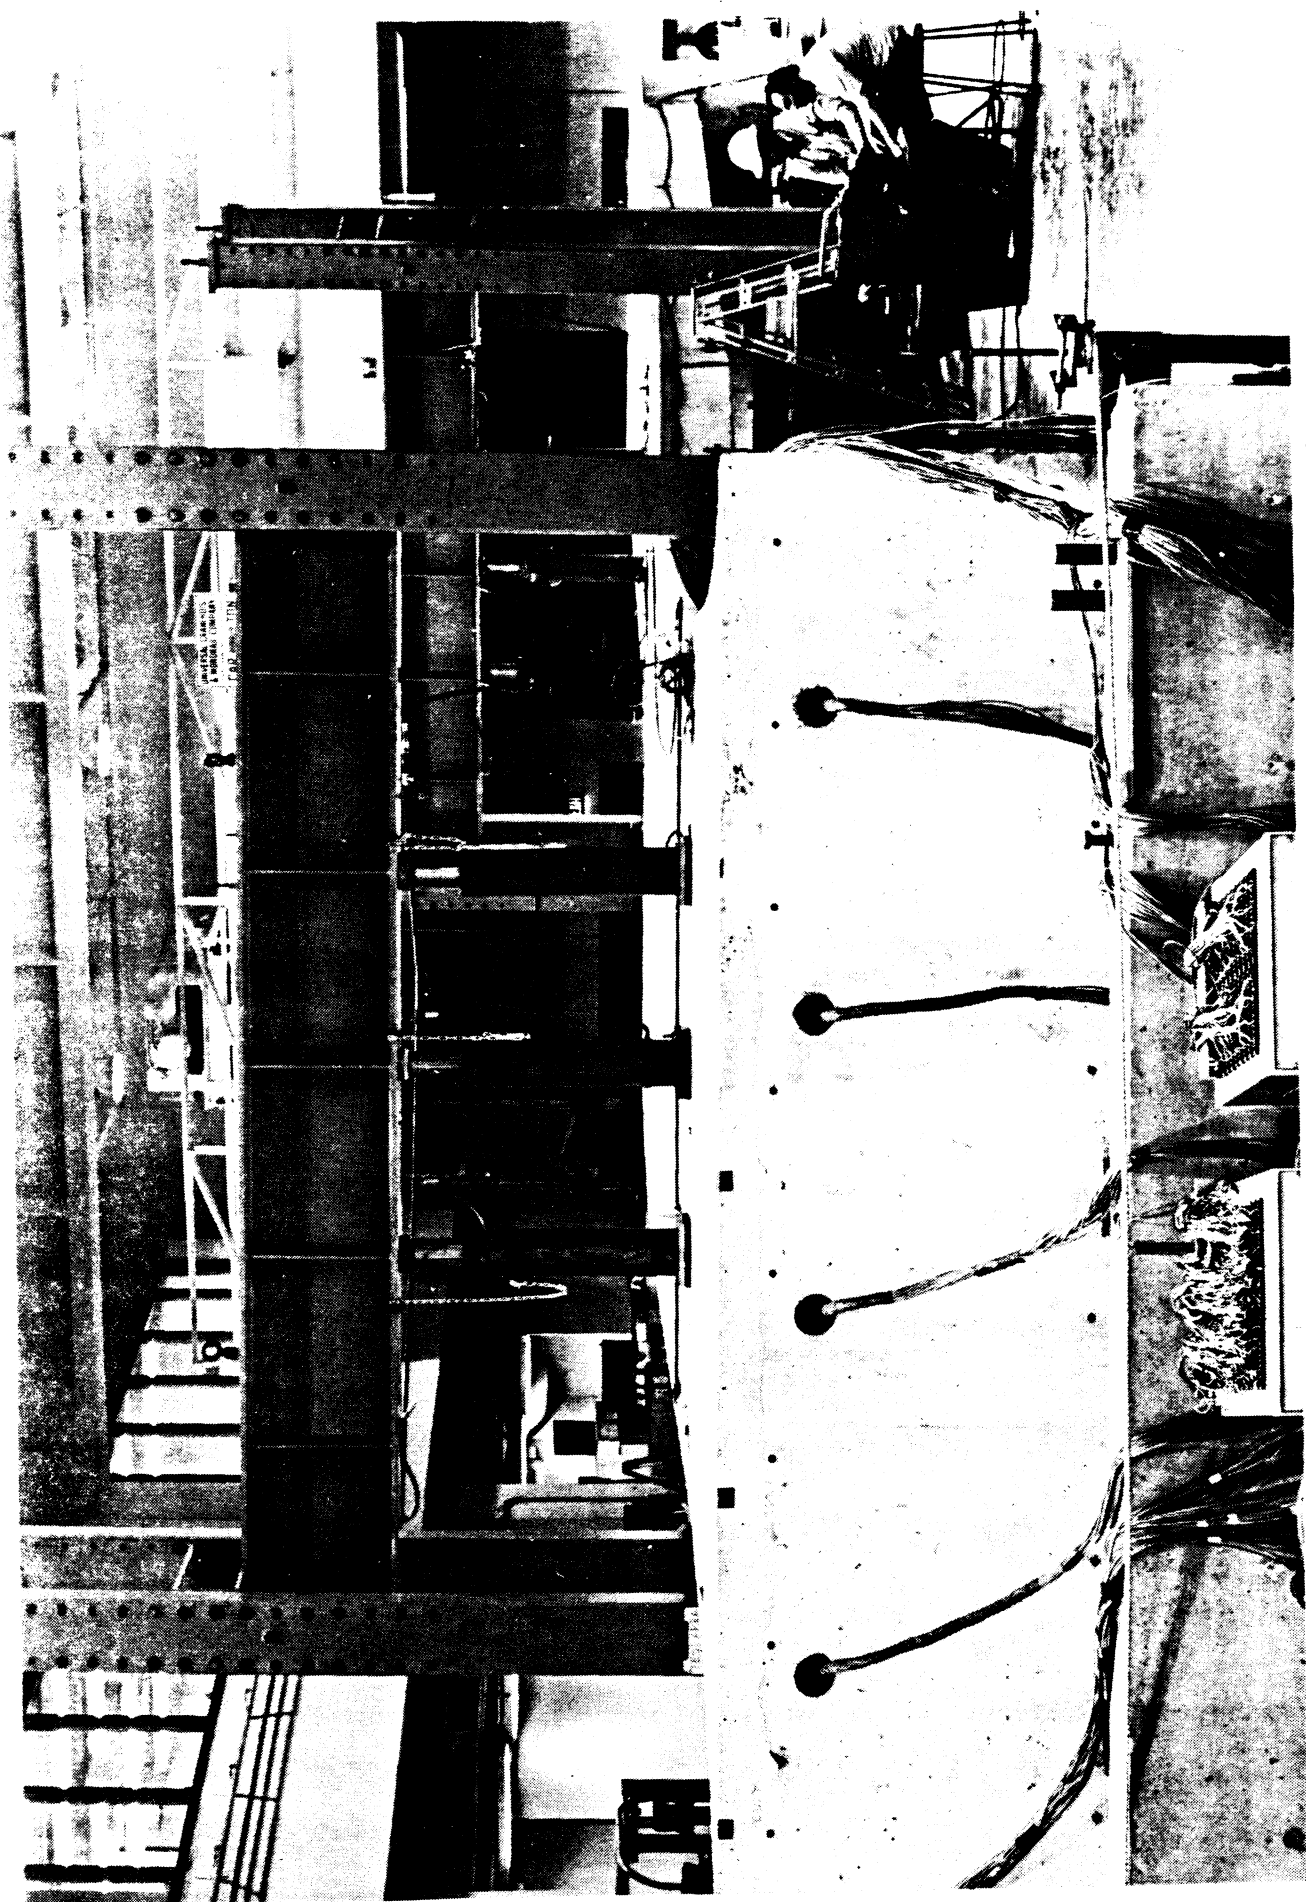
BRIDGE MODEL BEFORE FAILURE DURING FINAL LOAD TEST
